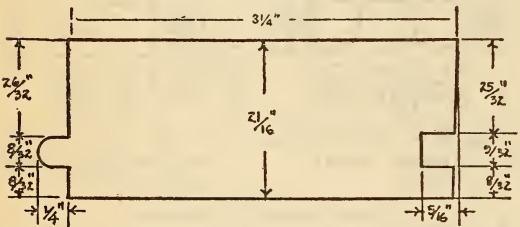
1½ by 4 inch kiln-dried flooring, green, 3⅜-inch face
